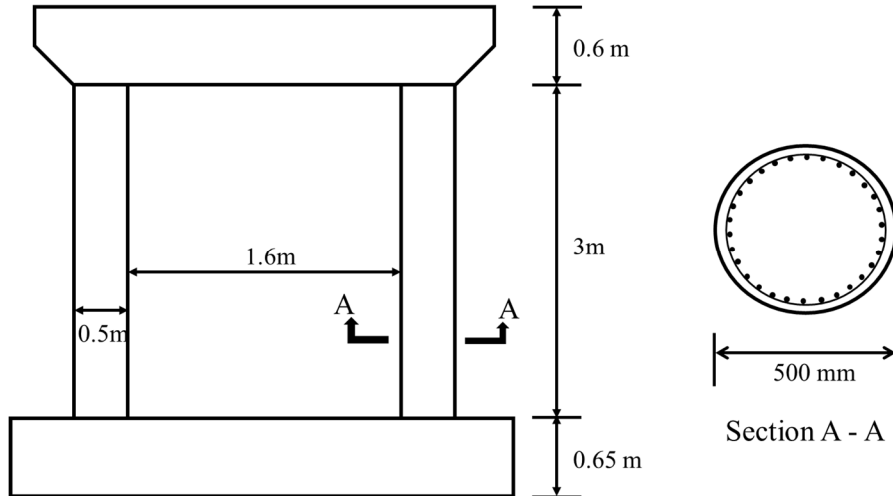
Elevation and column cross-section of specimen RH-NS-T (Kim et al. 2021)
